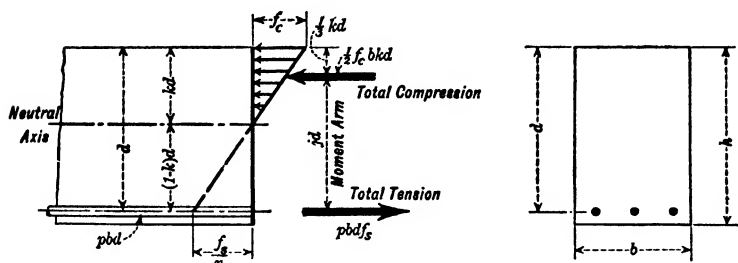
Resisting Forces in a Reinforced Concrete Beam. (See p. 129.)
